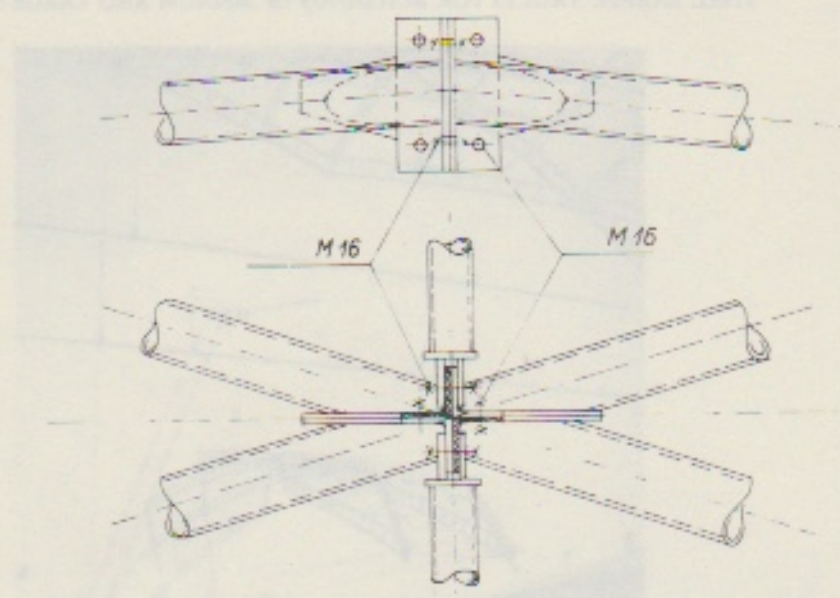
The plan and elevation of a typical 'cross' joint for a single-layer lamella structure. 4 main elements and 2 secondary lateral units are interconnected at the joint.
